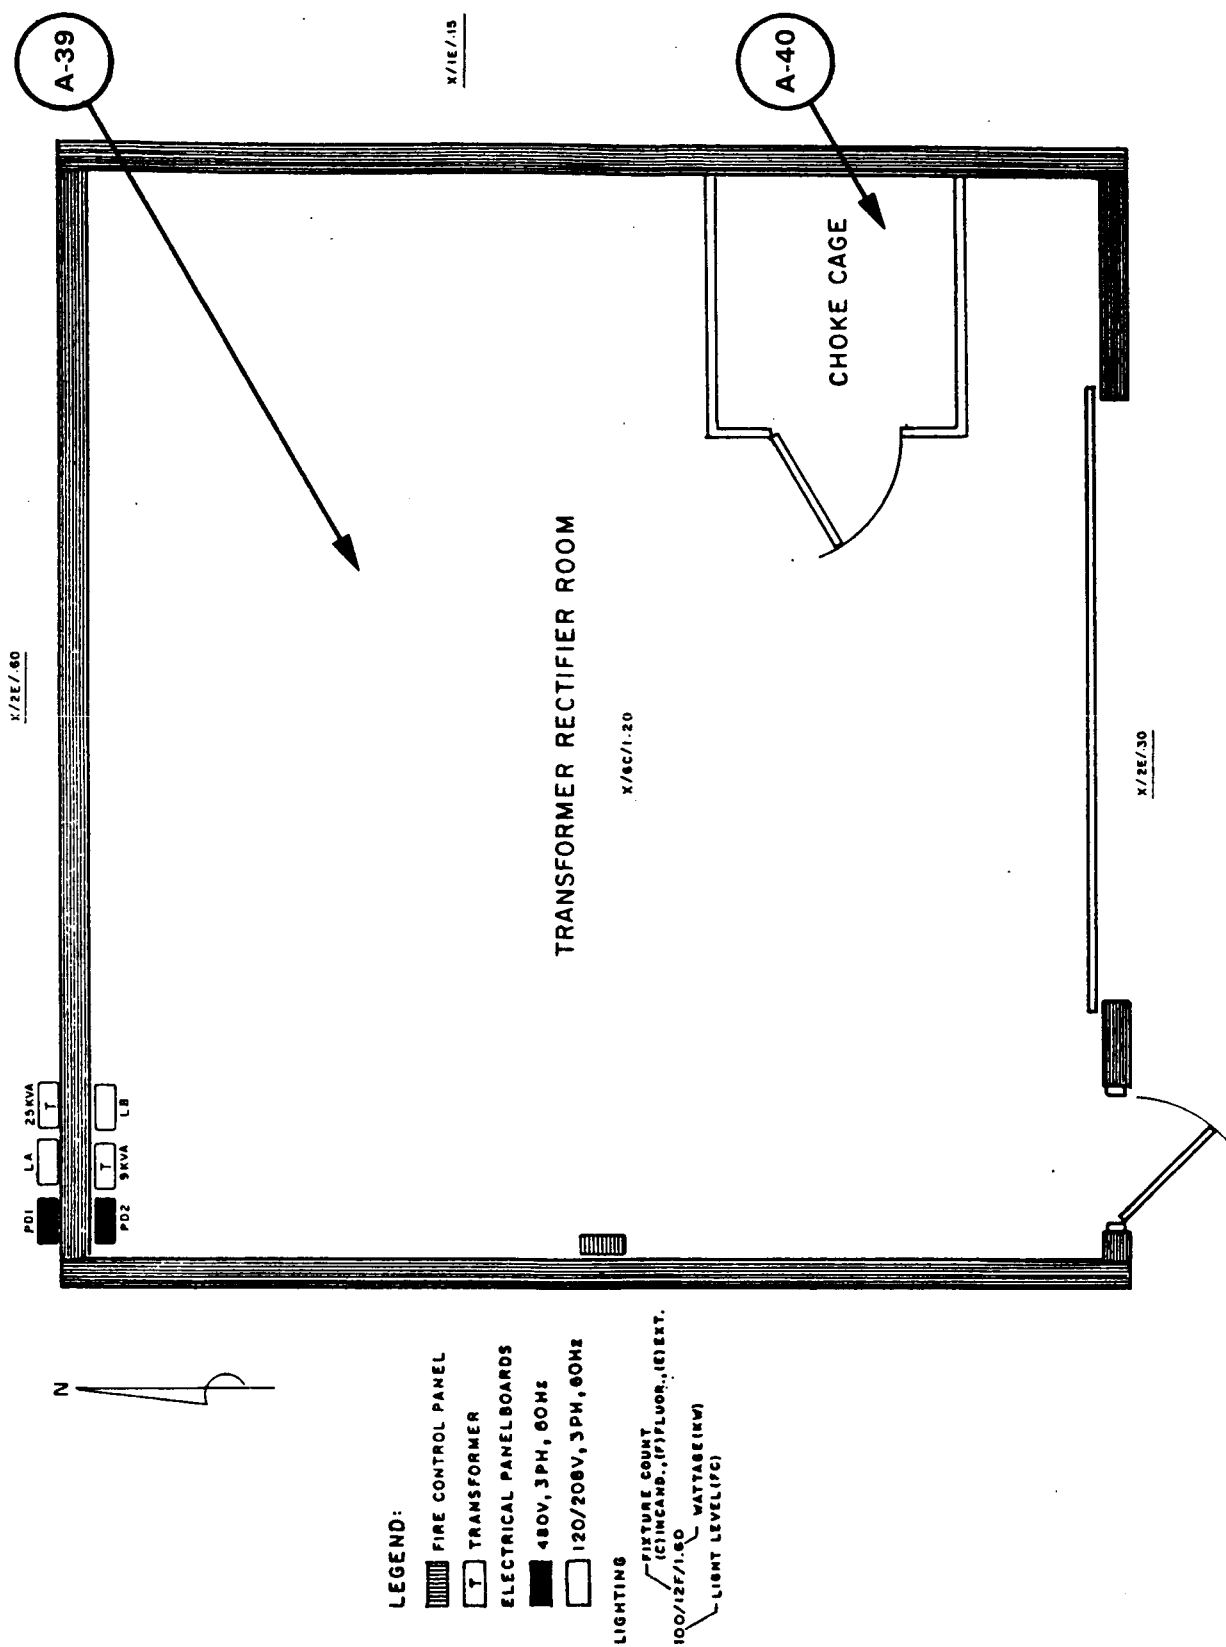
Mars Site: Transformer Rectifier Building (G-88)
